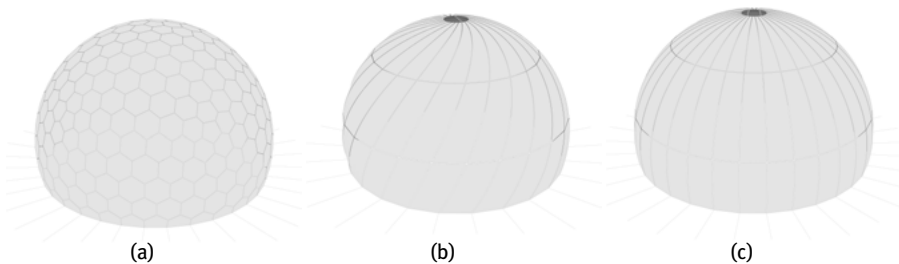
Preliminary design options: (a) geodesic layout, (b) slanted layout, (c) vertical layout.
